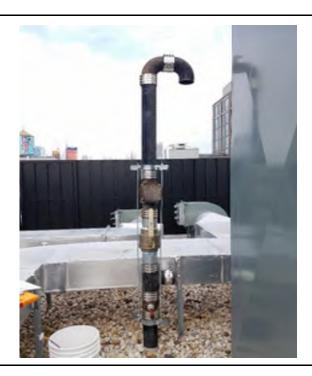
V1 riser in good condition, facing east. 27 February 2019.
